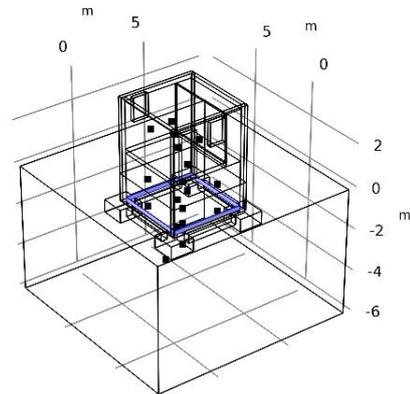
Model with foundation footings and slab with perimeter fracture.
